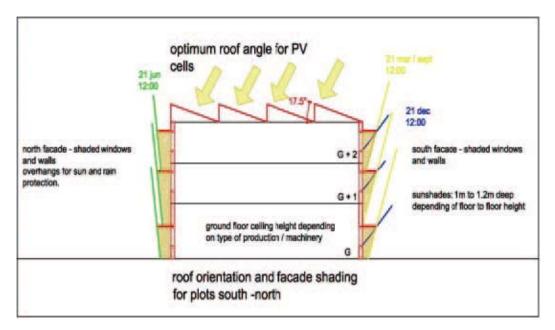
Example of roof design [Source: Guidelines for plot level building by Auroville Design Consulting]
